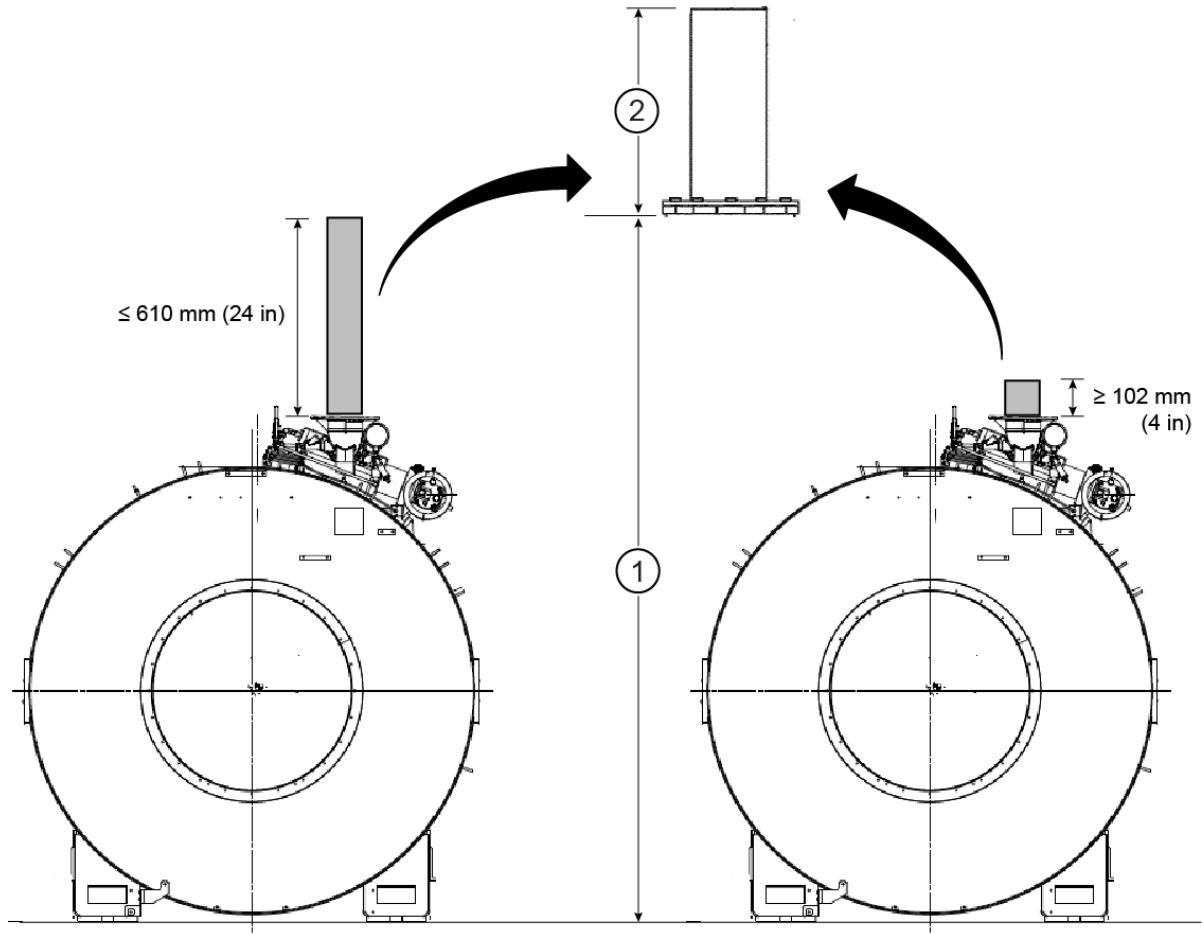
Pipe Supports to Remove Vent Load from Ventglas Connection (For all systems*)
